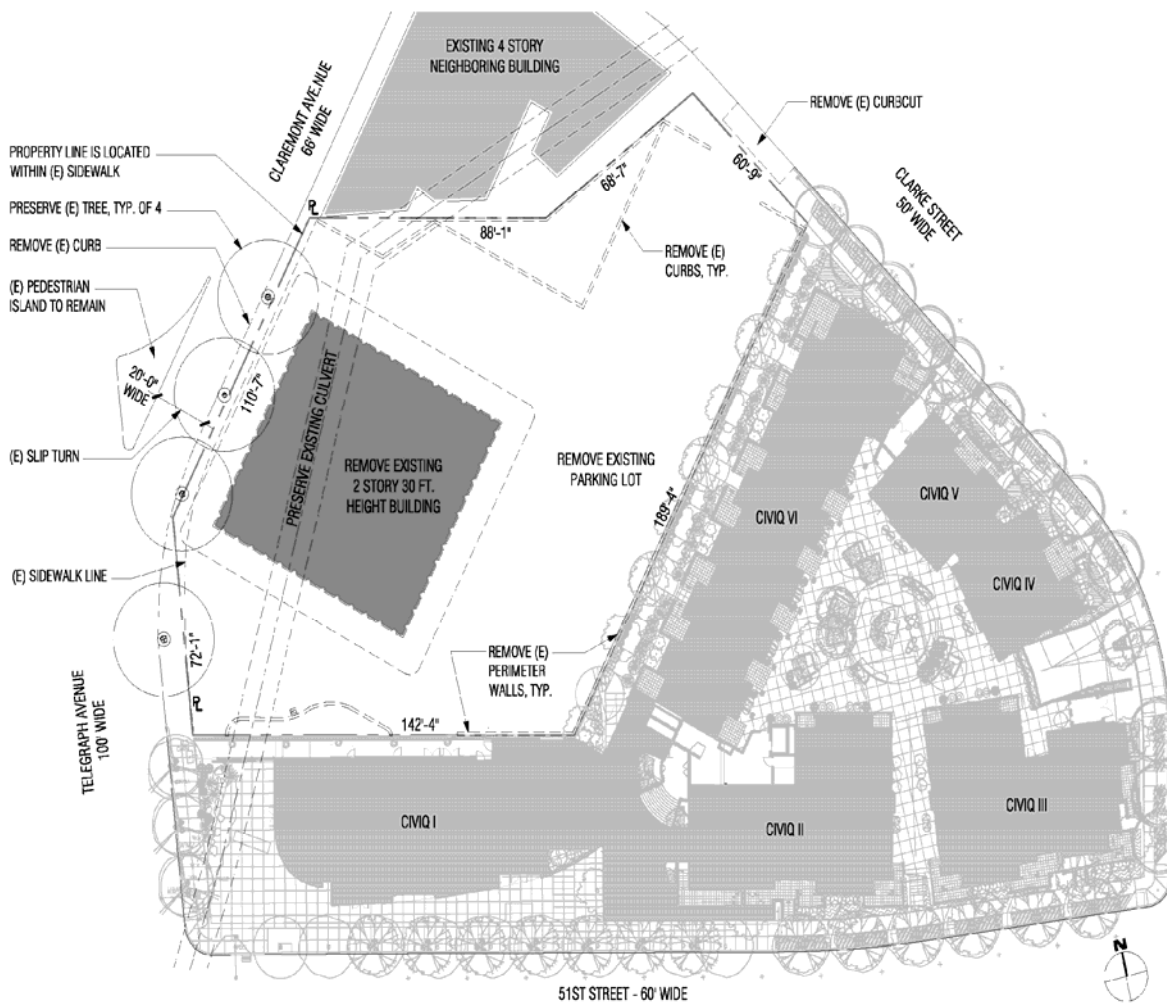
Existing Project Site Plan. Source: Hauser Architects.
